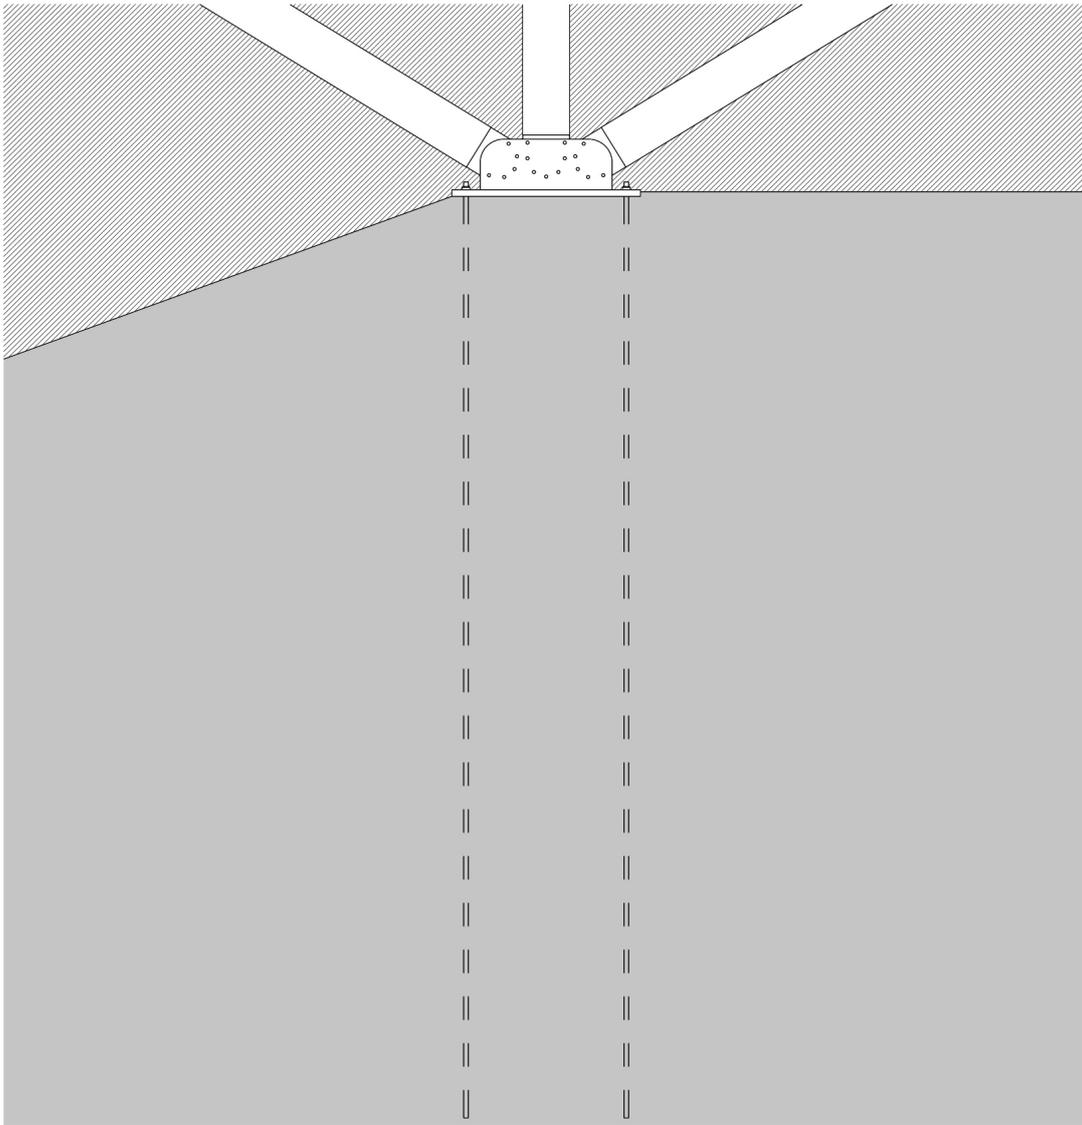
Drilling 6m deep holes in granite to install piles in preparation for steel pillars. Original author
